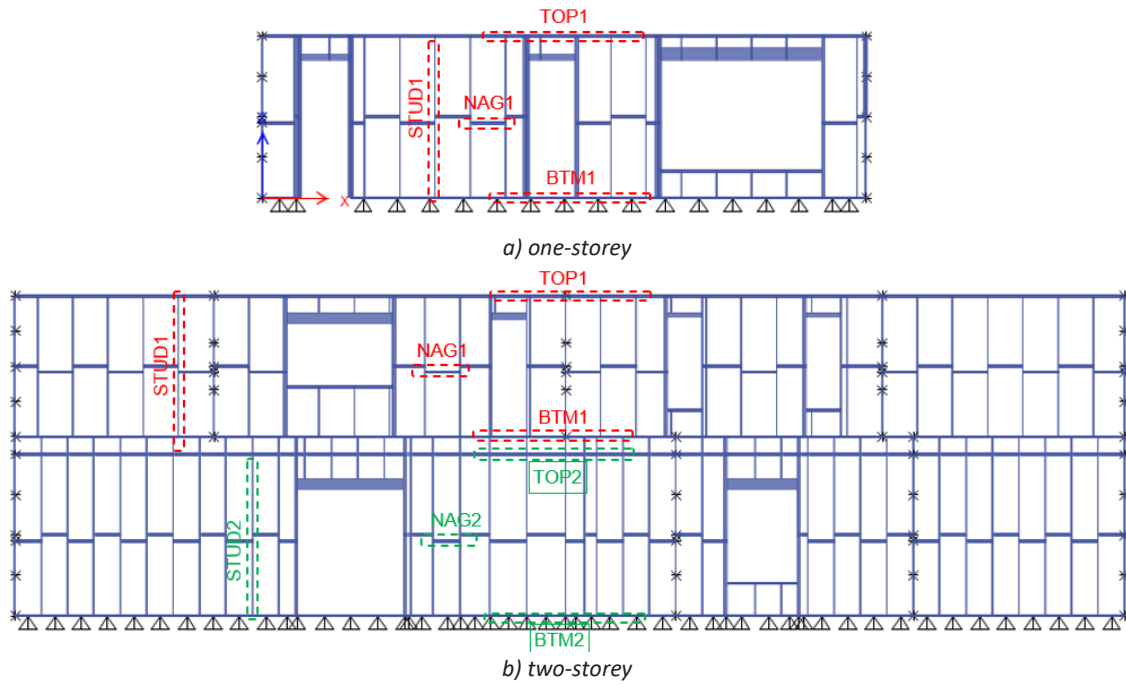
Framing elevations of 3D model. categorising convention for outcomes. STUD1: studs in the 1-storey building and the upper storey of the 2-storey buildings; STUD2: studs in the lower storey of the 2-storey building; TOP: maximum internal forces in the top plate; BTM: maximum internal forces in the bottom plate; NAG: maximum internal forces experienced by the noggings.
